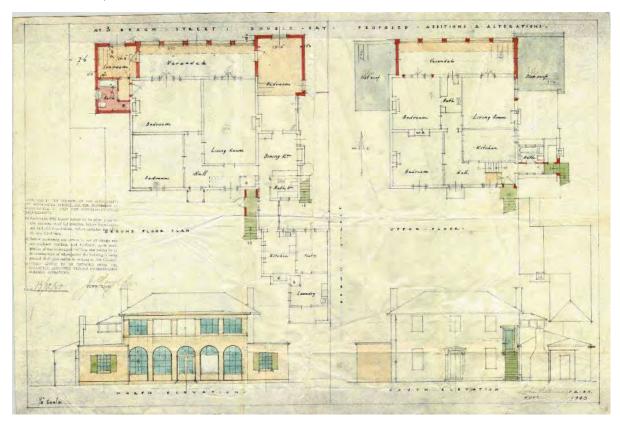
Plans from BA71/1945 (Source: Woollahra Records)
